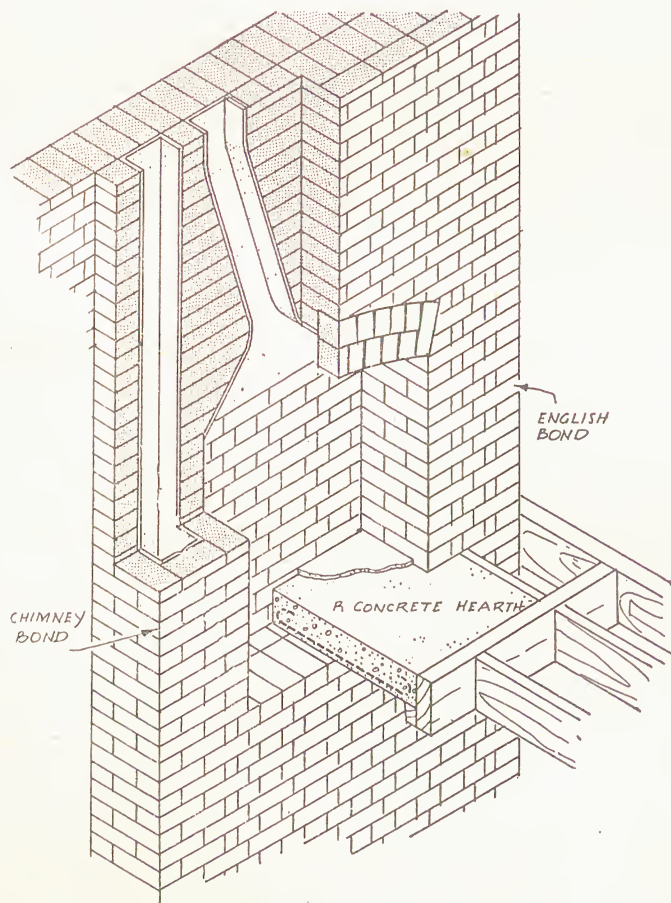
Upstairs fireplace and flues with brickwork cut away to show construction.
